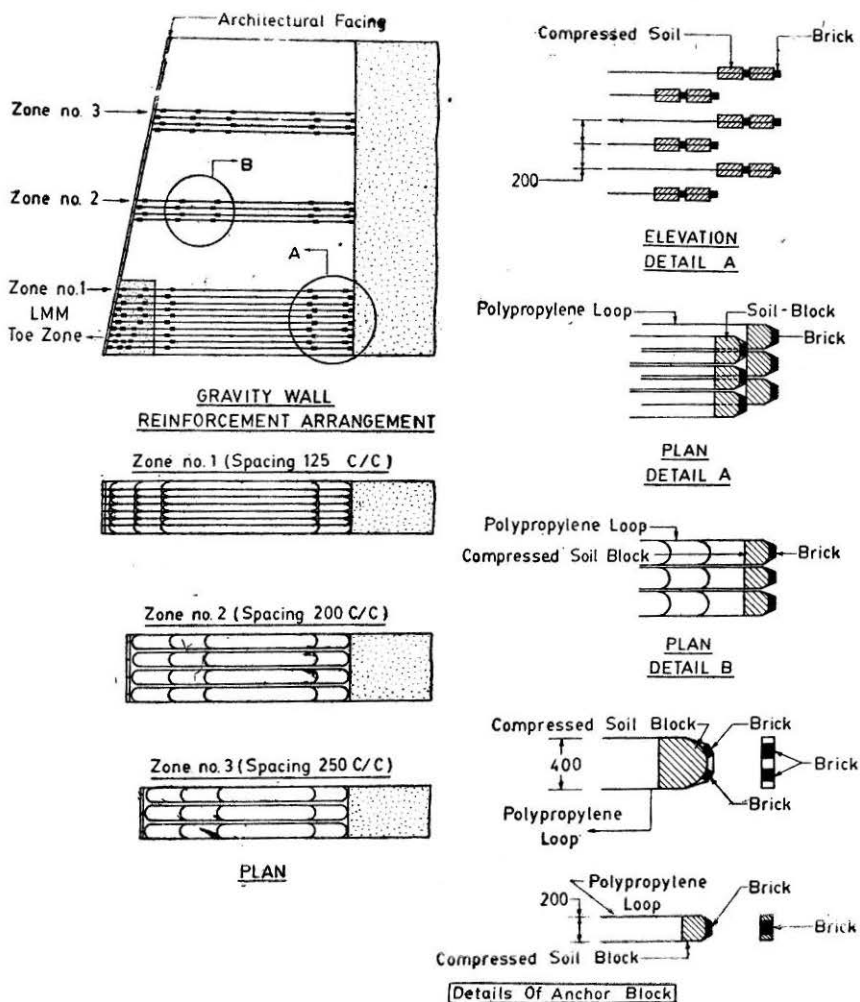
Details of type 1 reinforcement for a gravity wall
